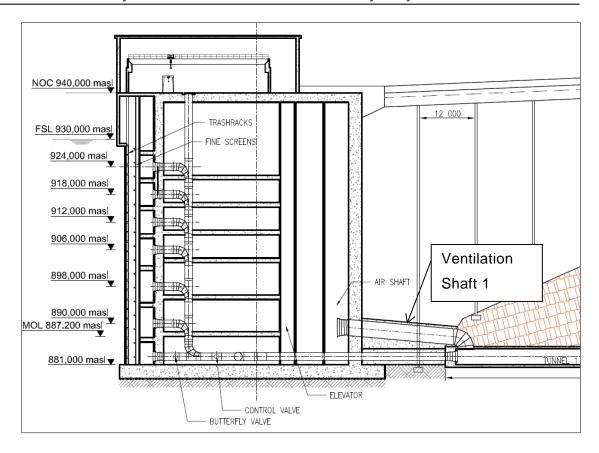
Section through tunnel inlet showing provision of air entrainment measures
